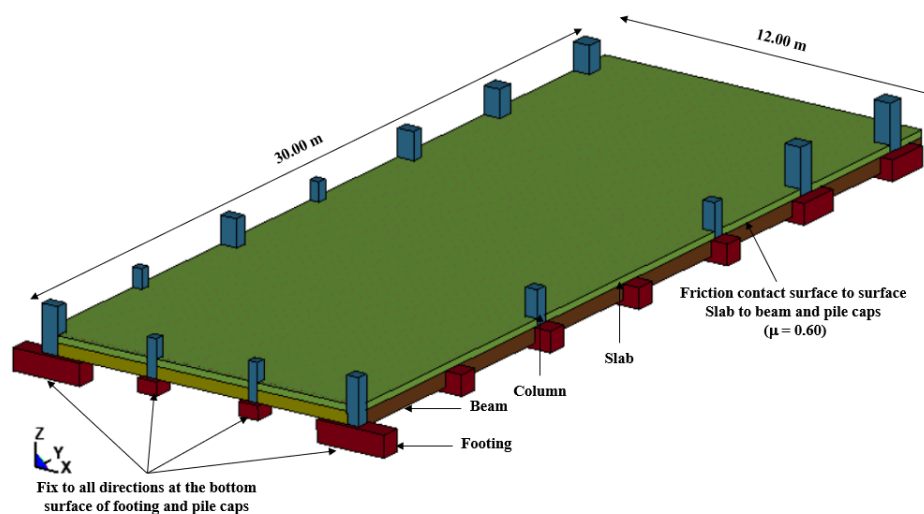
Three-dimensional FE model of slab on beam at construction site 1
